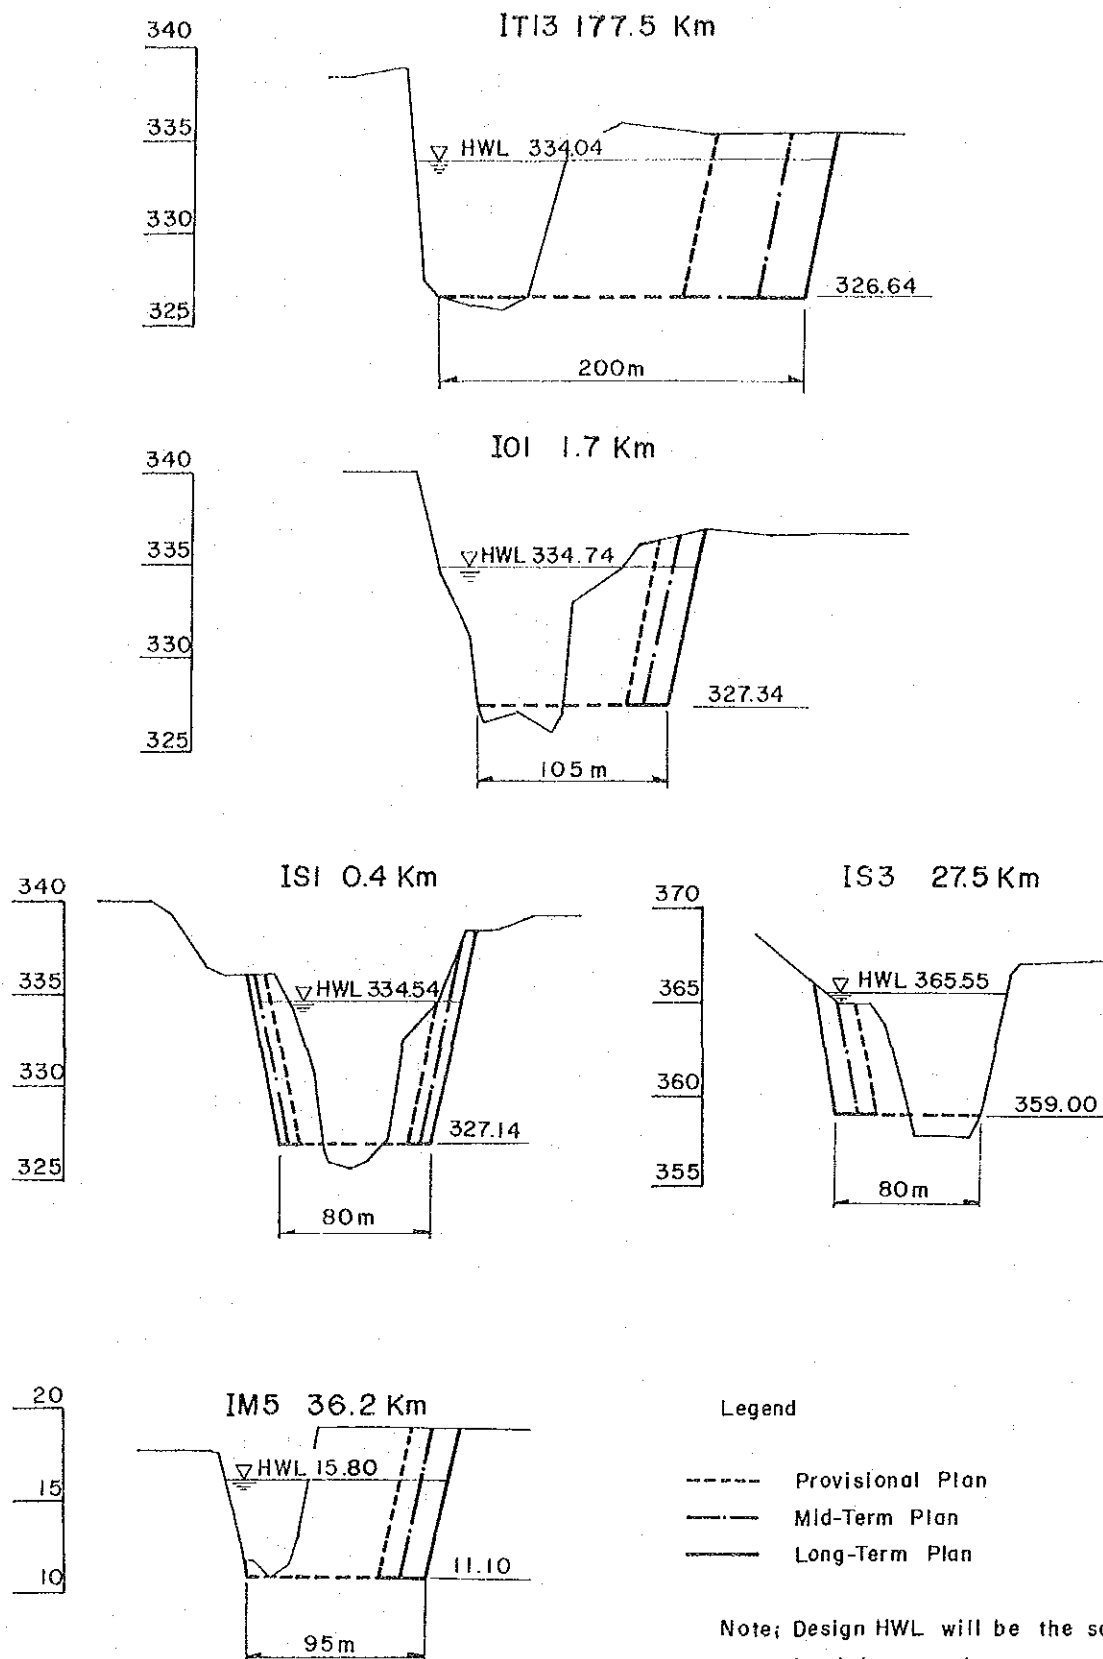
TYPICAL CROSS SECTION (4/4)
